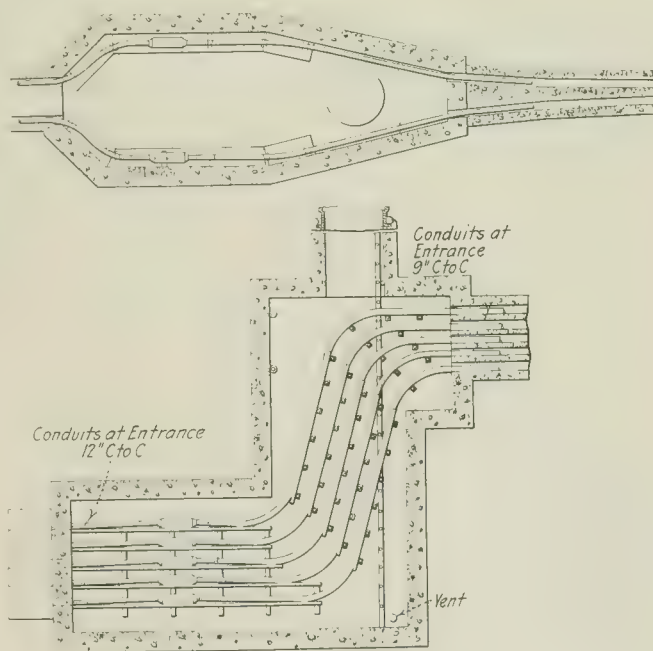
STRAIGHT-LINE TWO-LEVEL MANHOLES OF LARGE SIZE HAVING REINFORCED-CONCRETE WALLS
